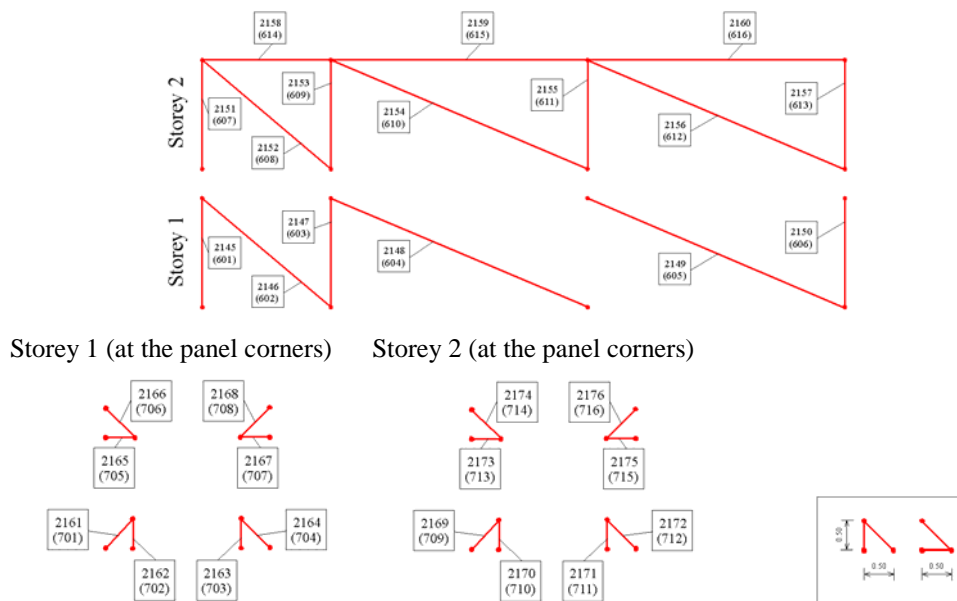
Infill masonry instrumentation (numbering): 1<sup>st</sup> and 2<sup>nd</sup> storeys
